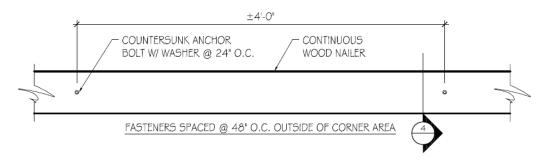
B - TYPICAL ROOF EDGE WOOD BLOCKING - THROUGH BOLT ANCHORAGE
